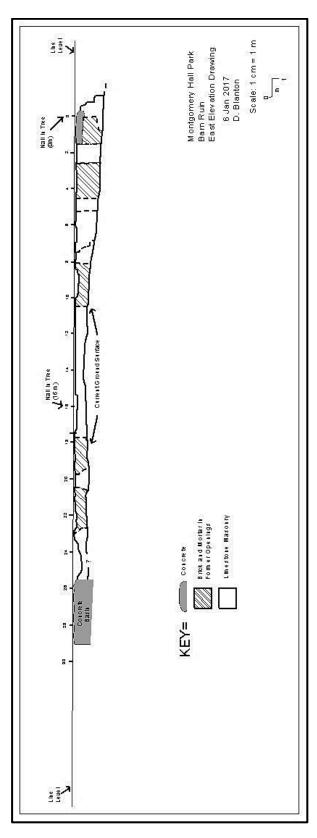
Barn Site, Front (east) side elevation of barn ruin.
